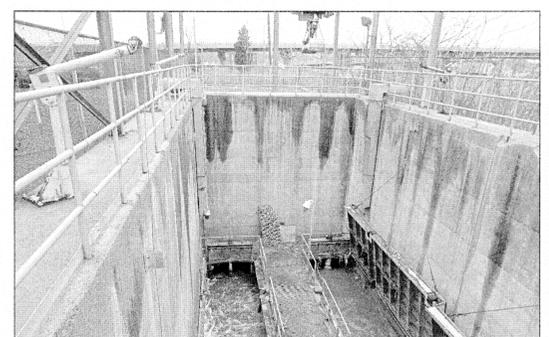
GRIT CHAMBER - INSIDE VIEW, EXISTING CONDITION
